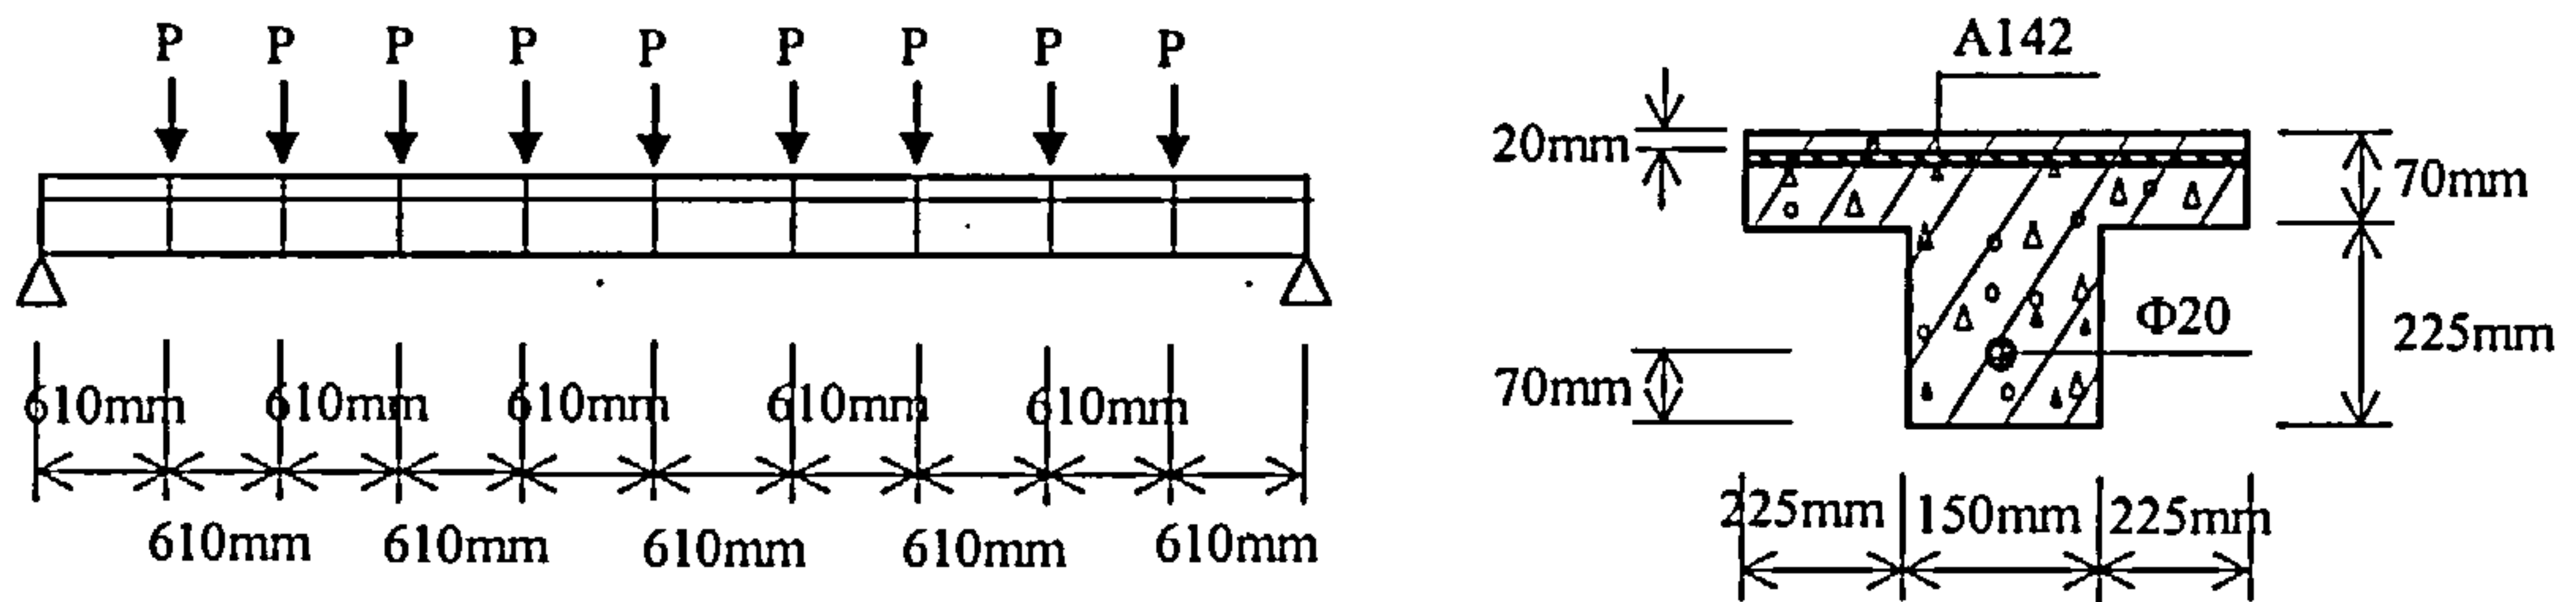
Reinforced concrete beam as used to model the concrete rib of a Slimdek floor system at ambient temperature
